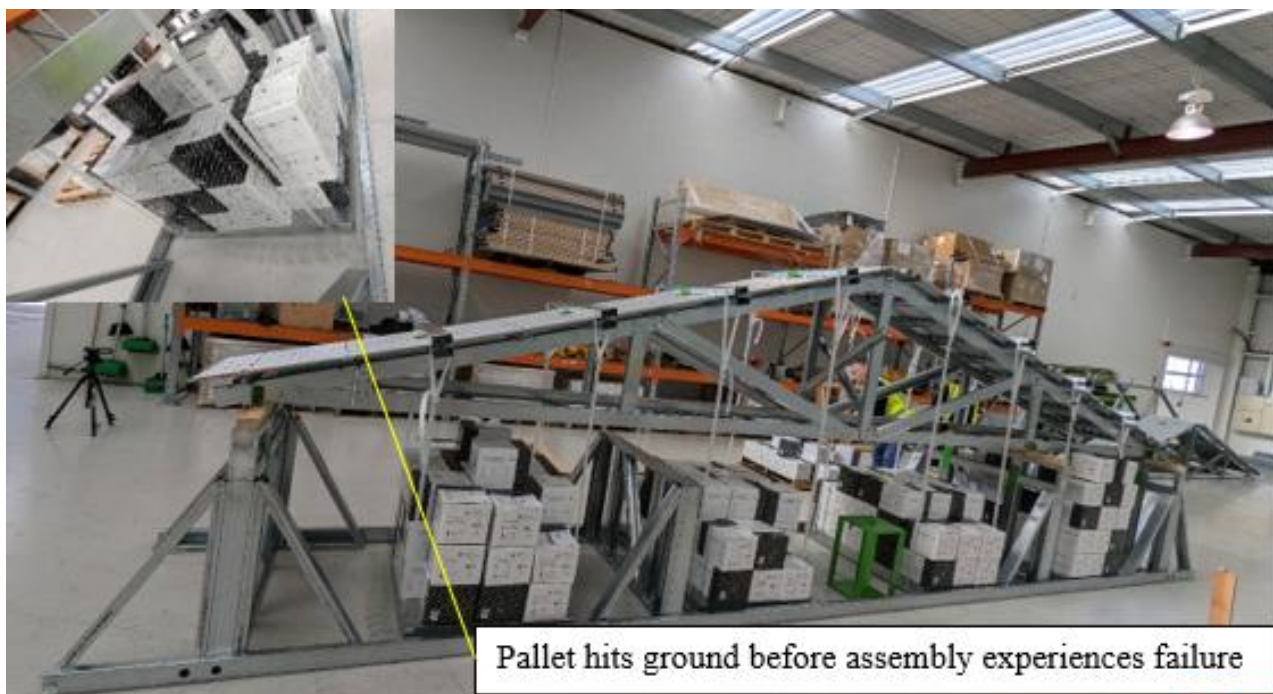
Out-of-plane buckling failure on Truss 2 of Test 4
